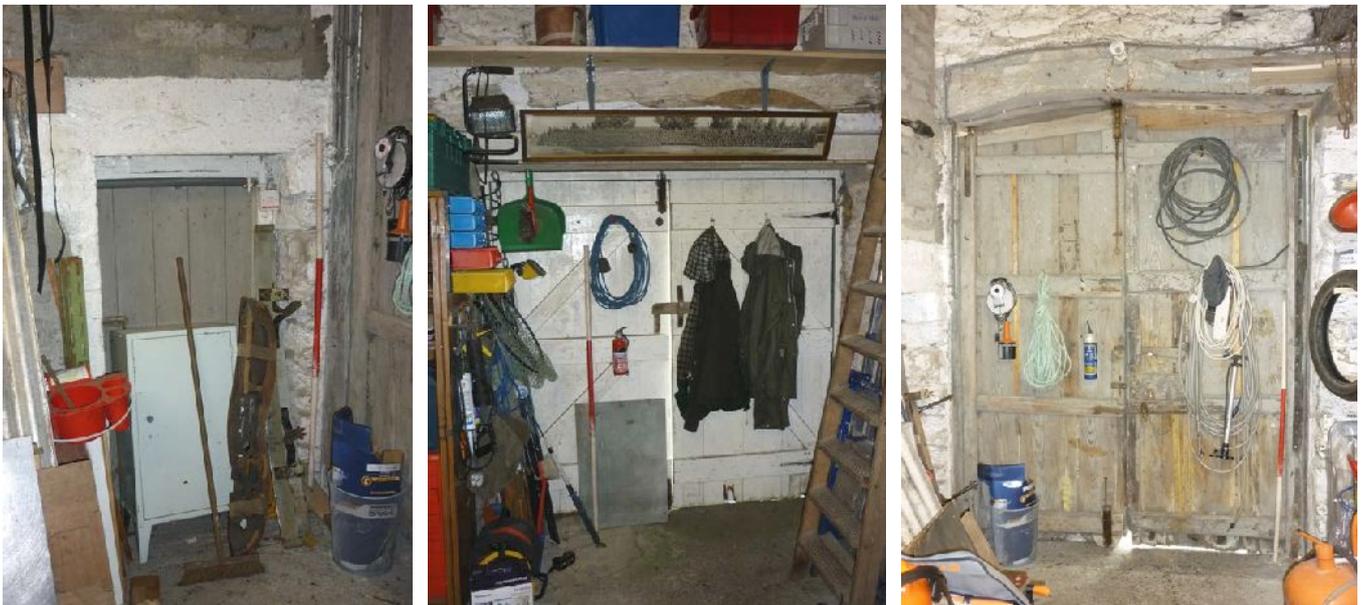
(left): Doorway in the north-east elevation of Ground floor Room 3
